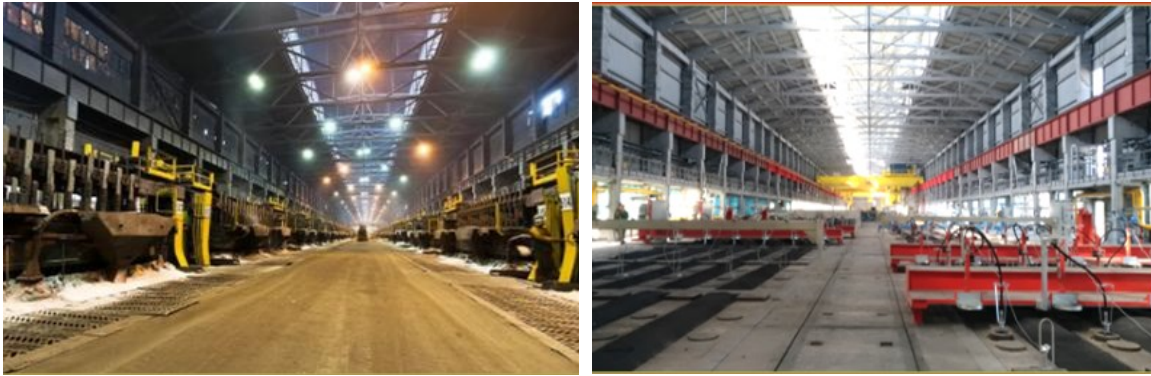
The potroom building. Left: before the retrofitting, right: after the retrofitting
